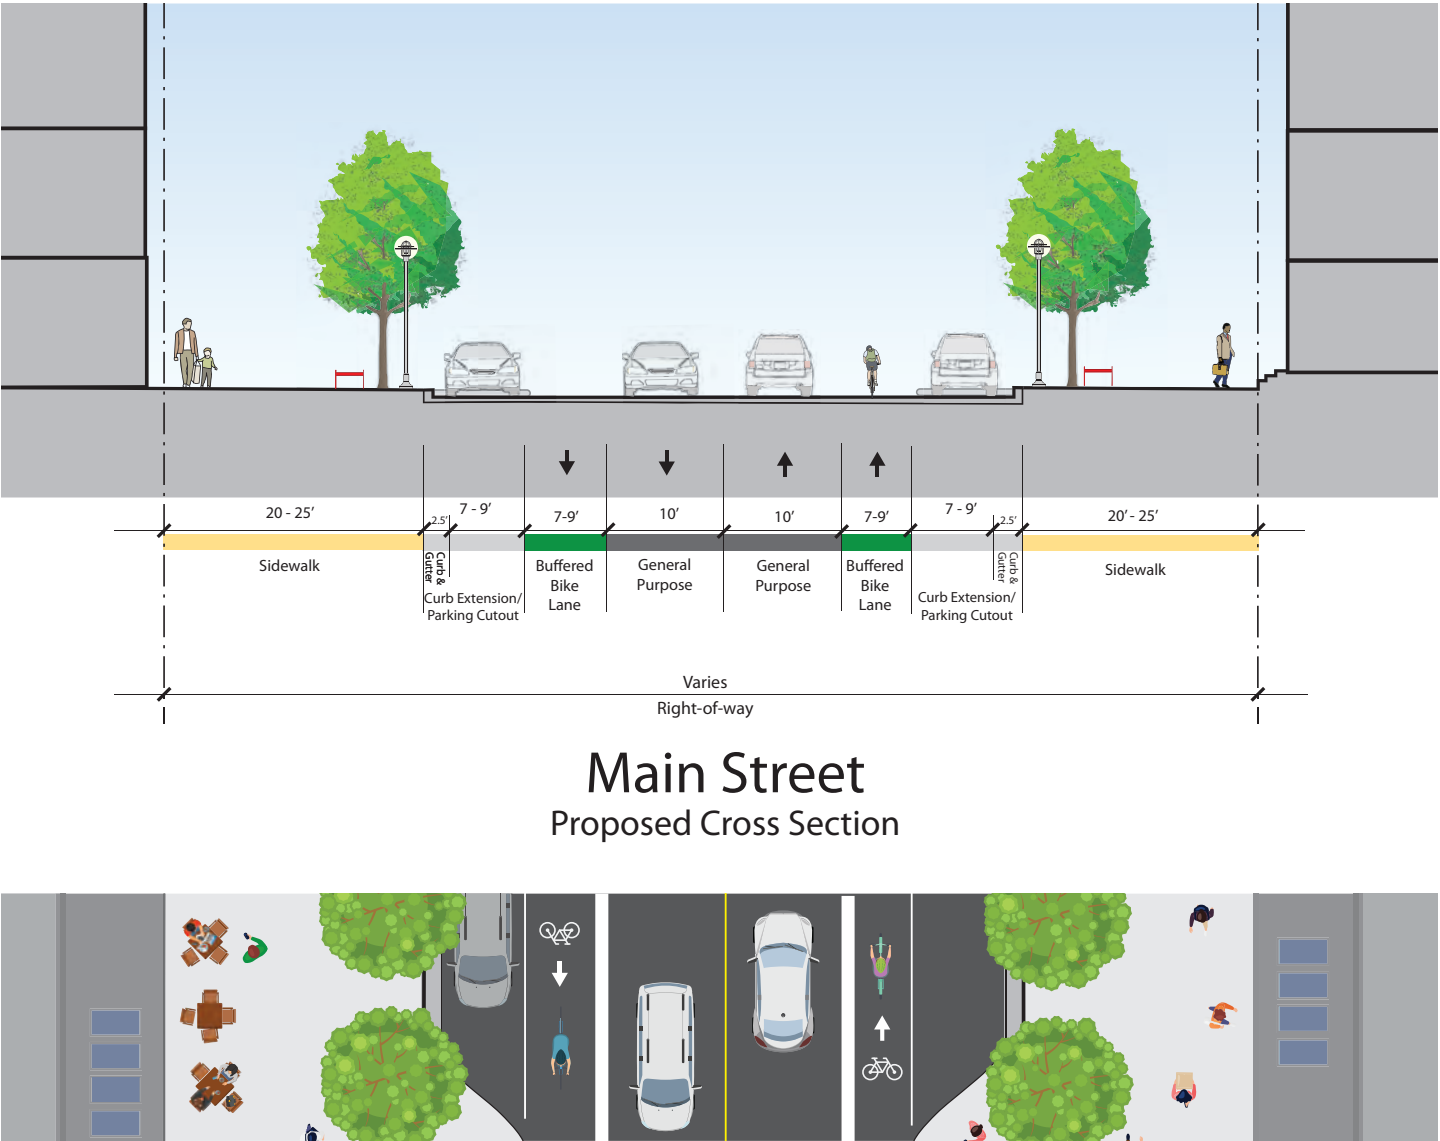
PROPOSED MAIN STREET CROSS SECTION
